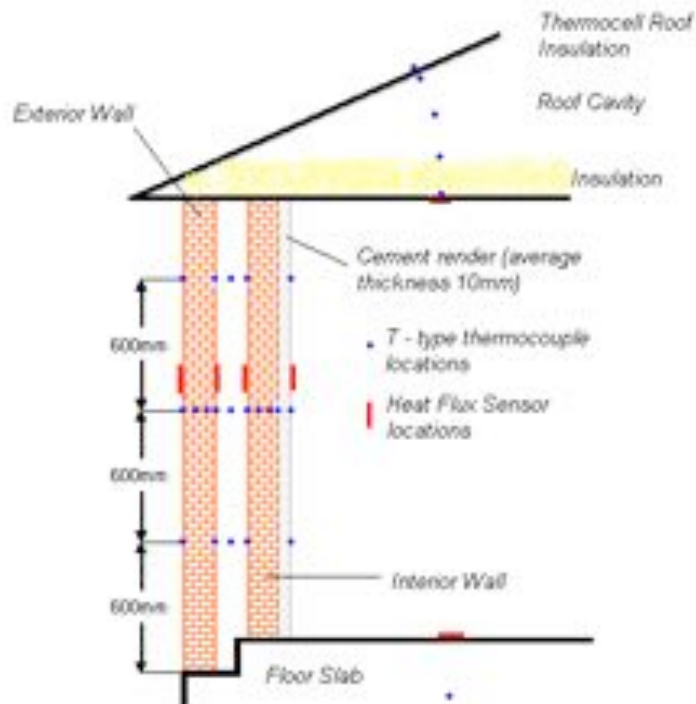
University of Newcastle Test Building: Detail of Double Clay Brick Wall
